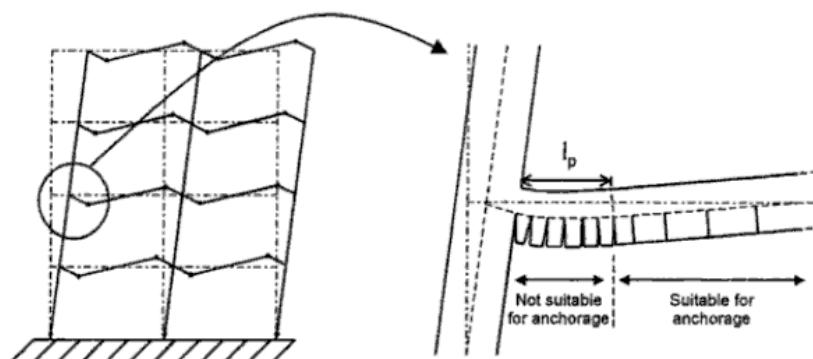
Member cracking assuming a strong-column, weak girder design
